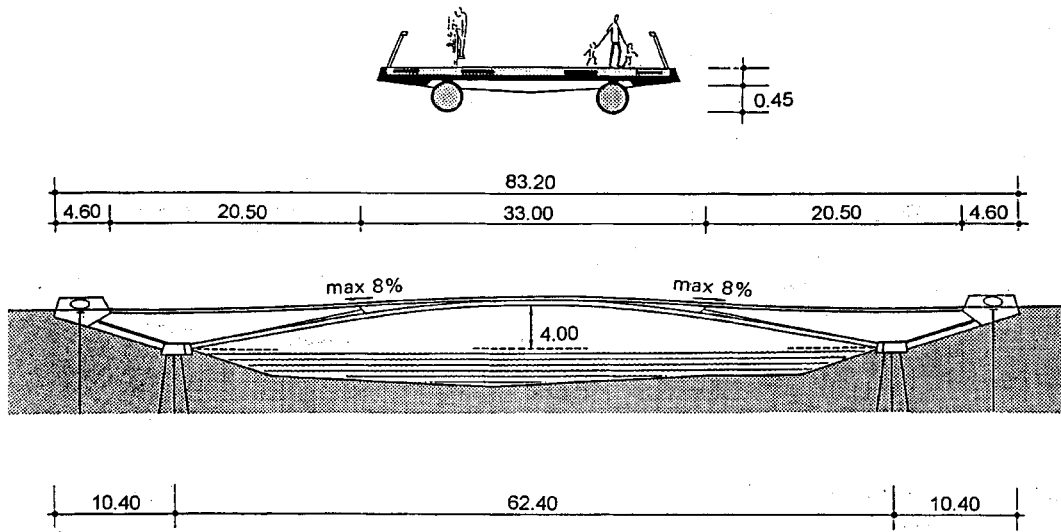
A footbridge supported by a pair of arches-design, dimensions in [m]
